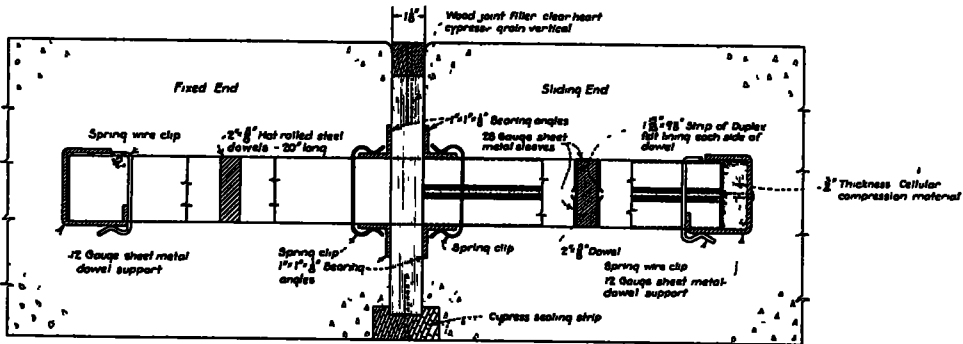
Cross Section of Expansion Joint as Recently Revised for Future Use.
